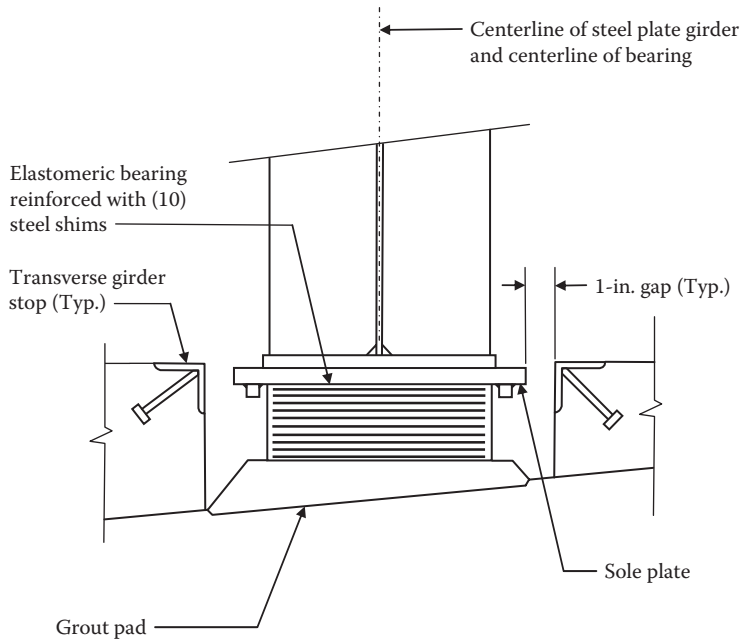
Steel reinforced elastomeric bearing (steel bridge).
